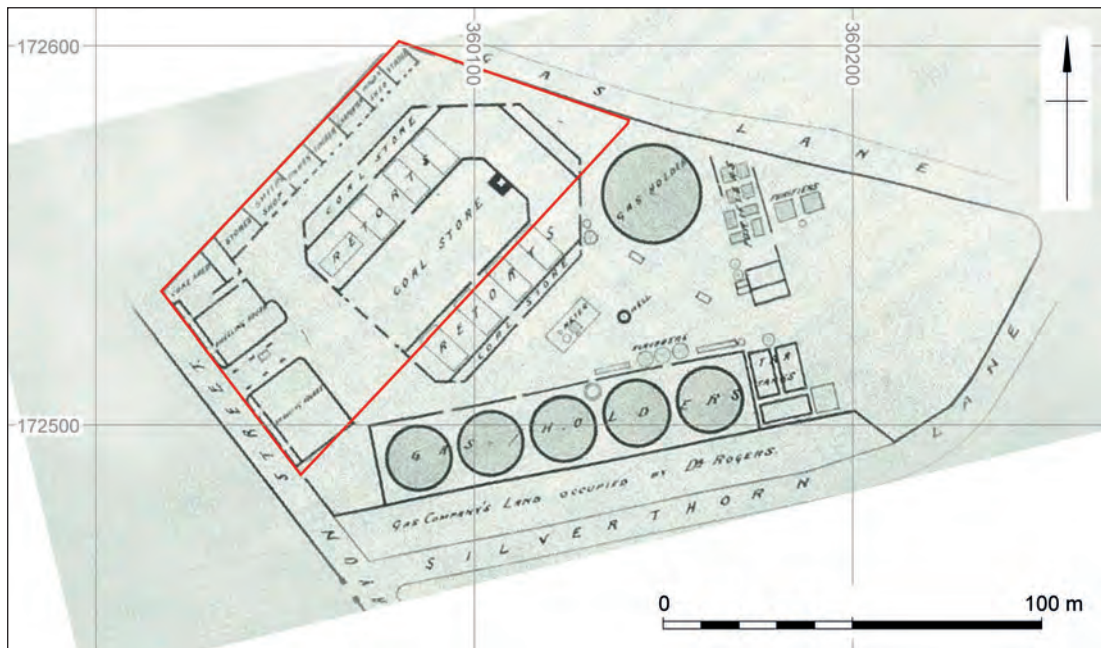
Plan of the Avon Street gasworks, 1857, used with permission of IGEM (seen at 1:2000).
